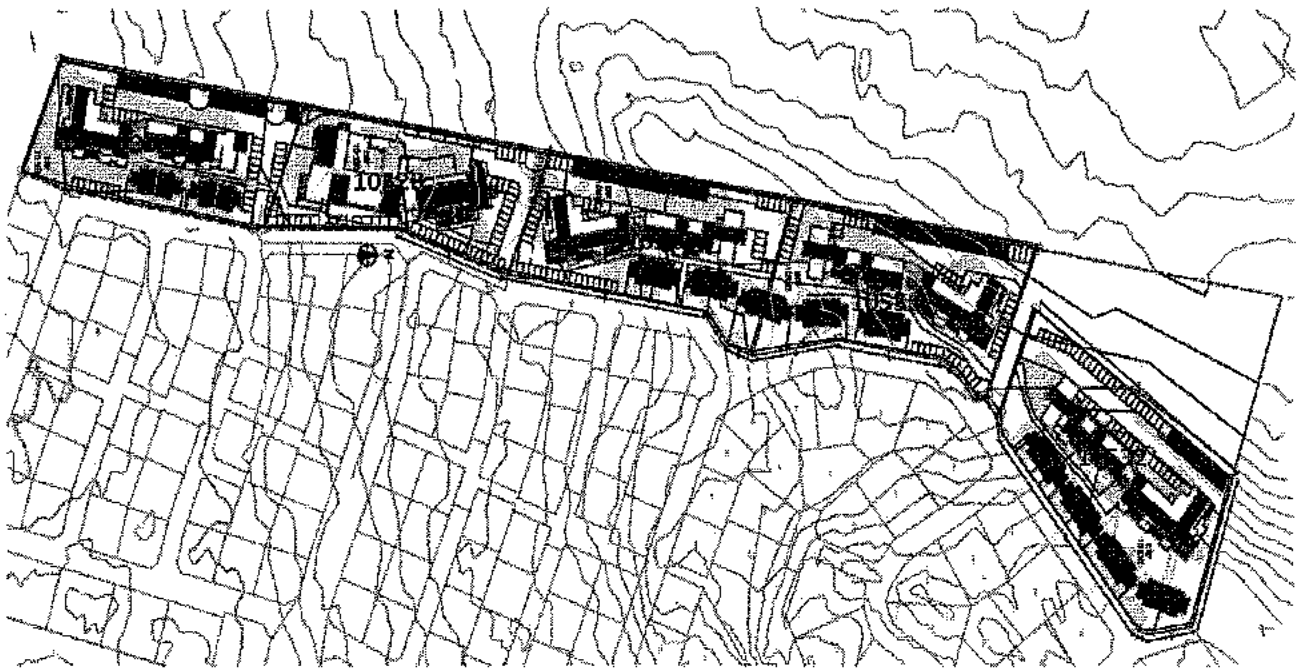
Master Site Development Plan (Finlayson Van Der Merwe Architects)
